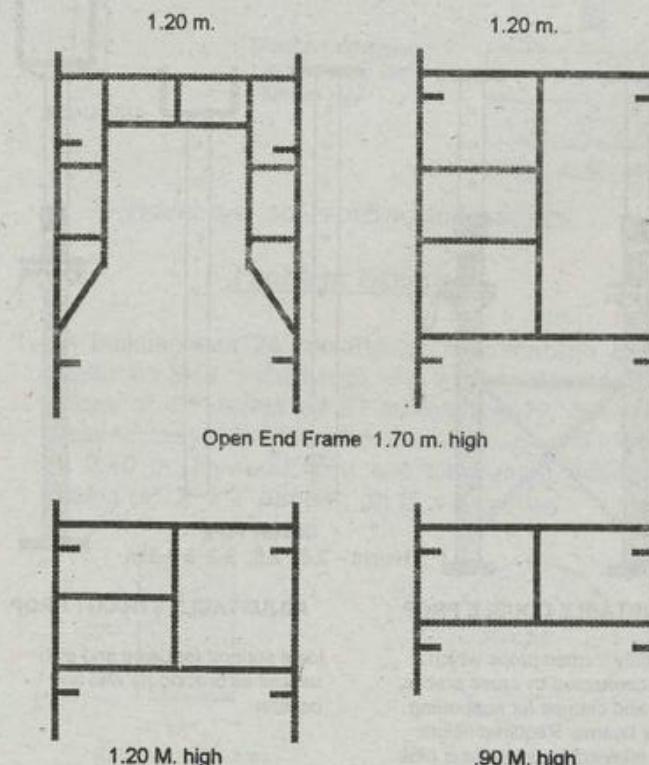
STEEL PIPE SCAFFOLDINGS
